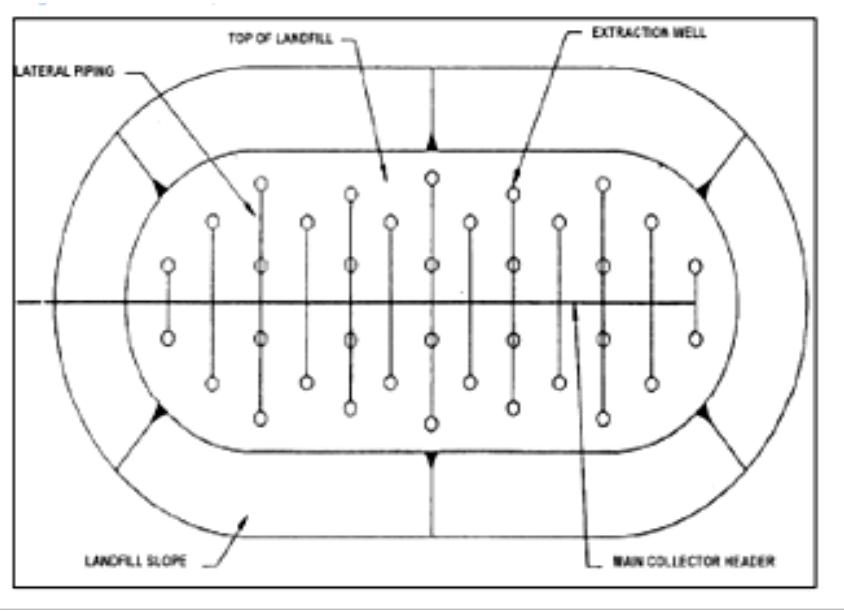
Typical Landfill Gas Extraction Layout on a Landfill
